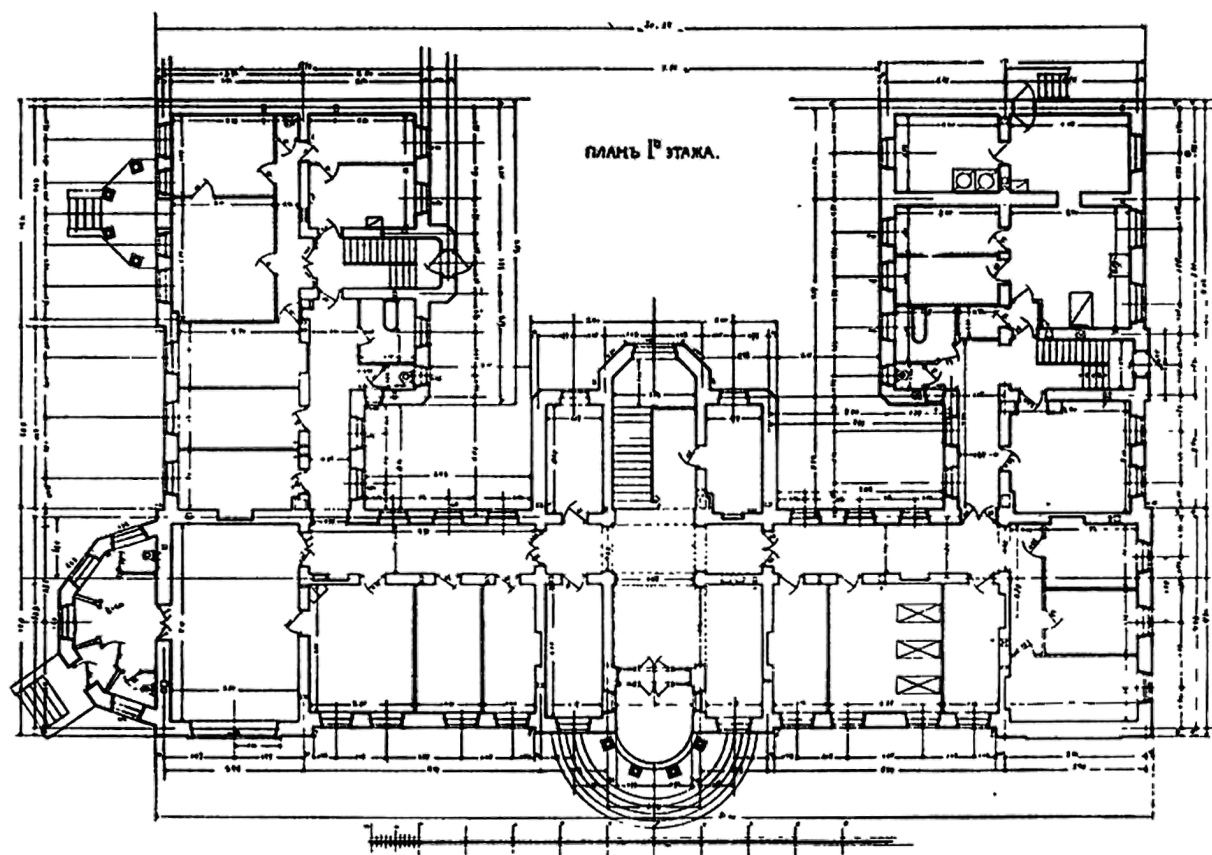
The building of the V.B. Perovskaya hospital for the poor. First floor plan [32]
